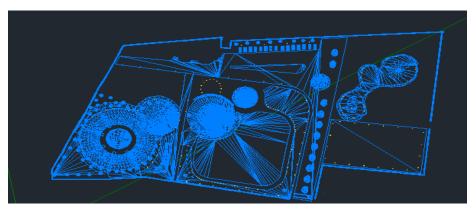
AUTOCAD LAYOUT OF AN AREA OF ECOLOGICAL PARK
